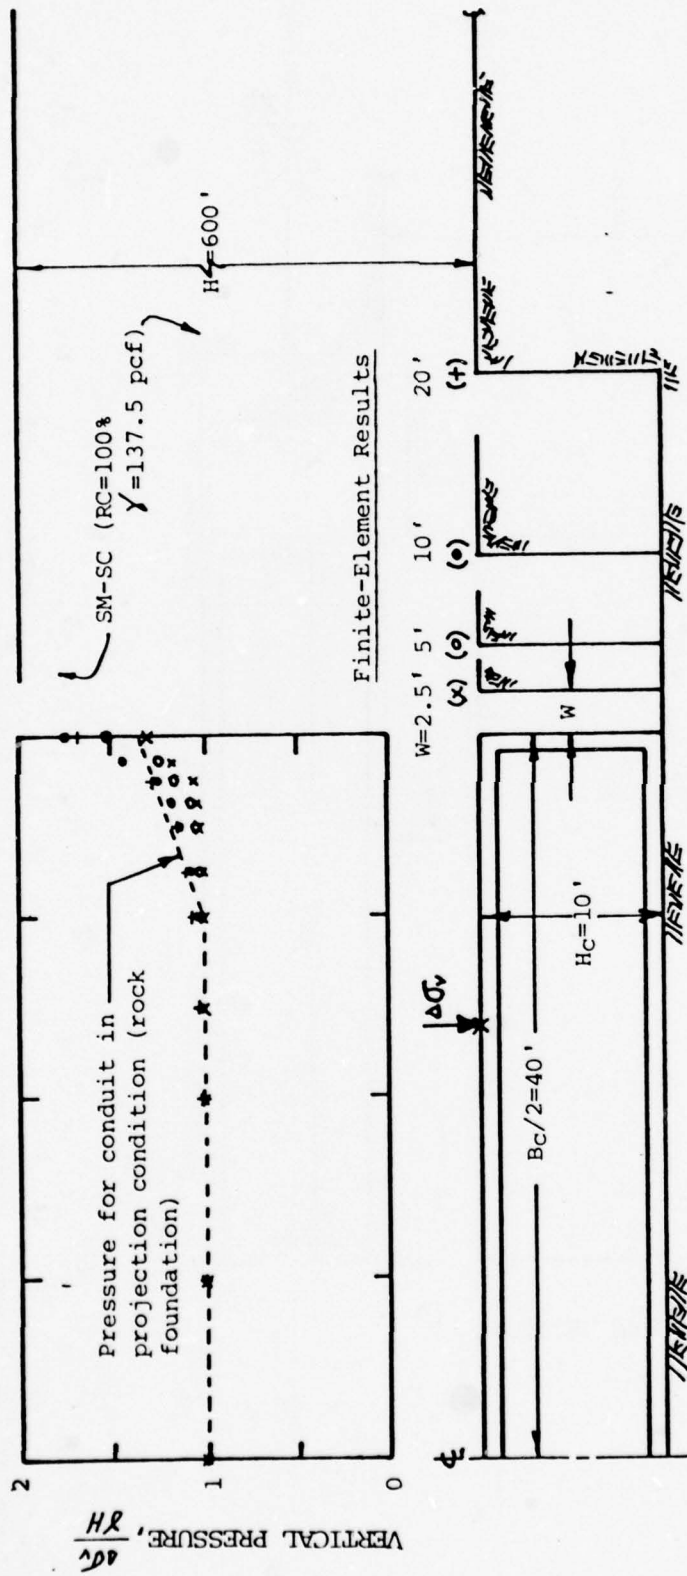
VERTICAL PRESSURE ON RECTANGULAR CONDUIT IN SHALLOW TRENCH WITH VERTICAL WALL
